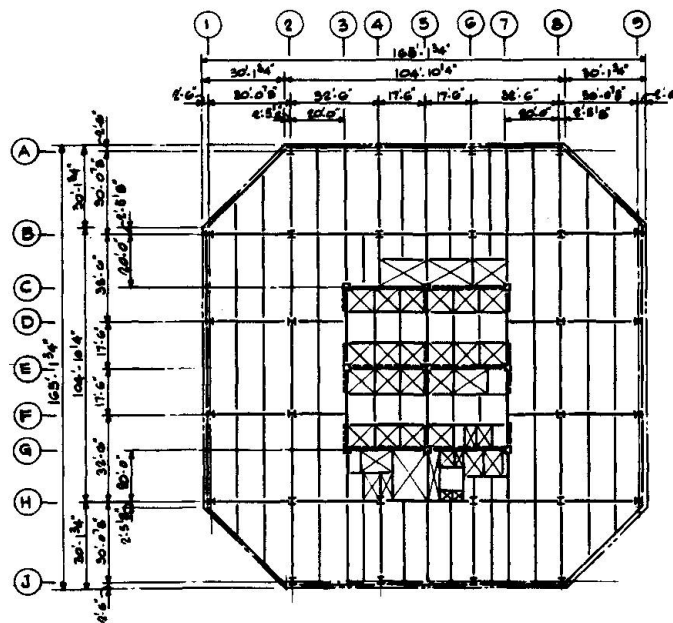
CONTINENTAL CENTER TYPICAL FLOOR
